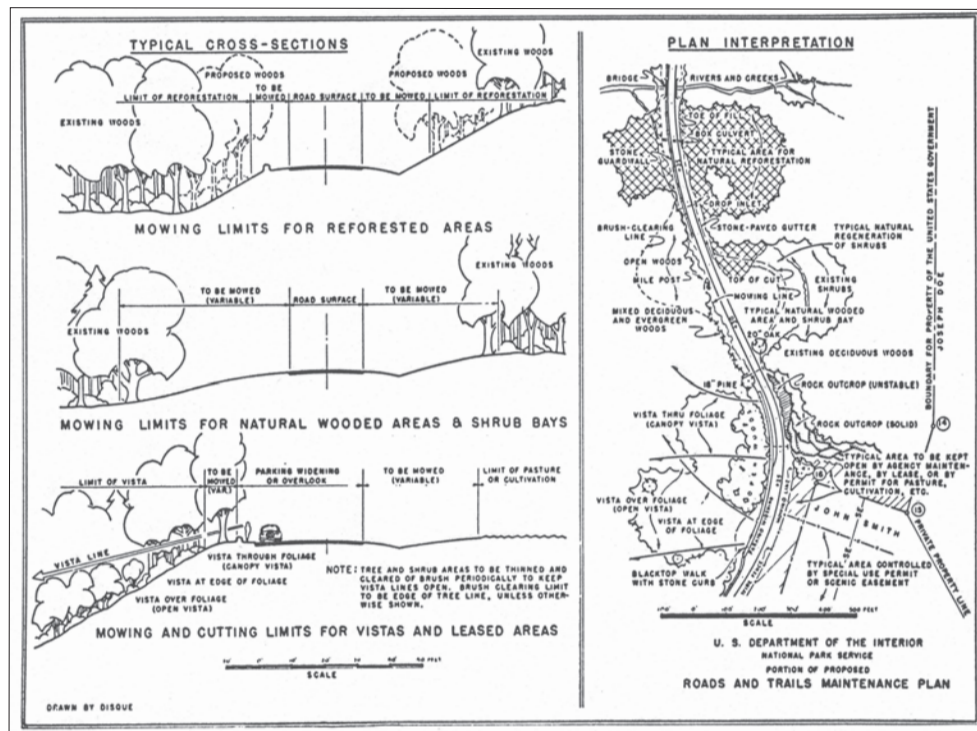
Typical Maintenance Plan and Section for Park Road or Parkway. (Bayliss 1957)
